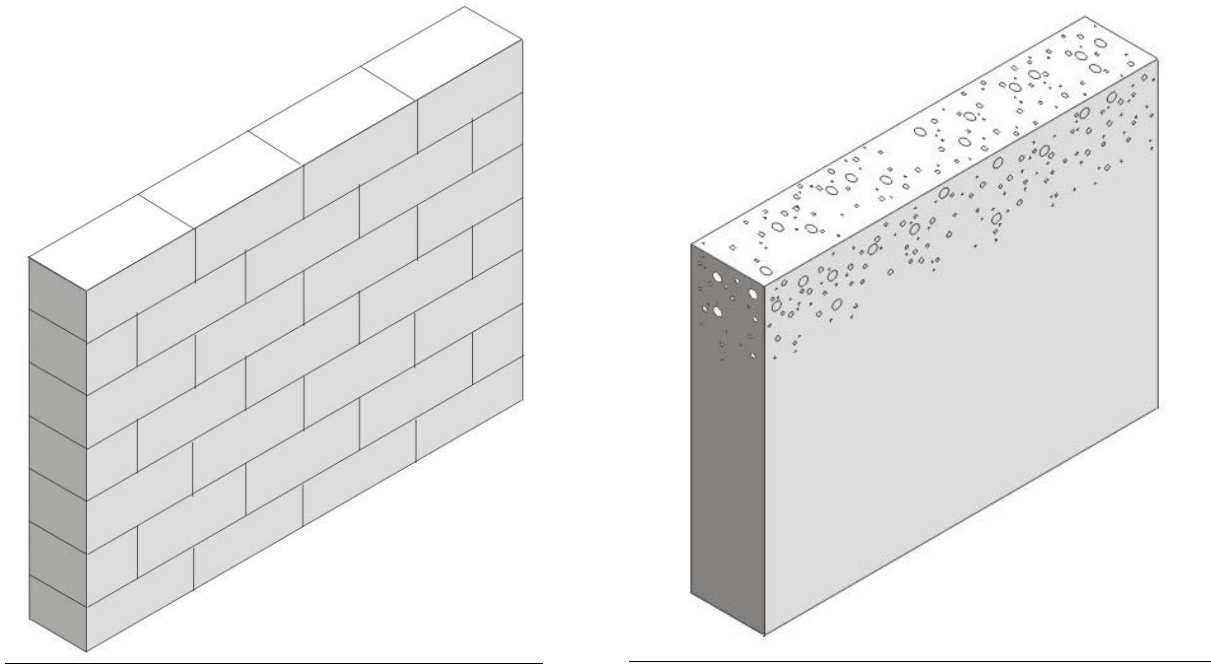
Solid Unit Masonry (left) and Solid Concrete (right) Walls
